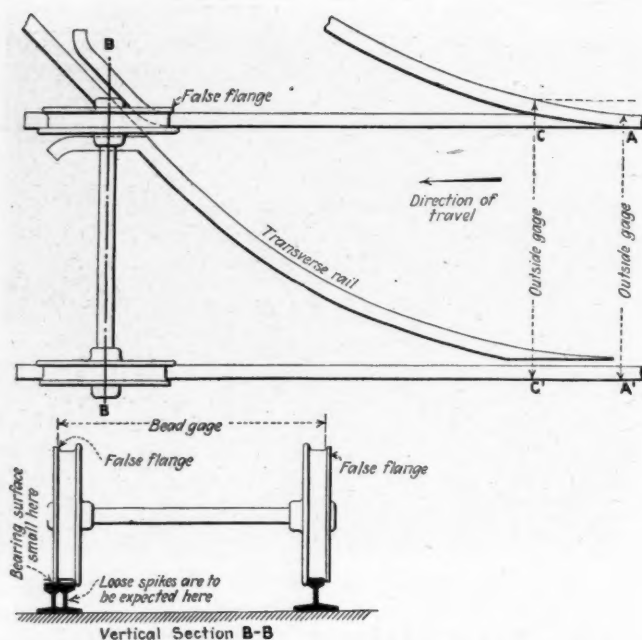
GROOVED WHEEL CROSSING A SWITCH
